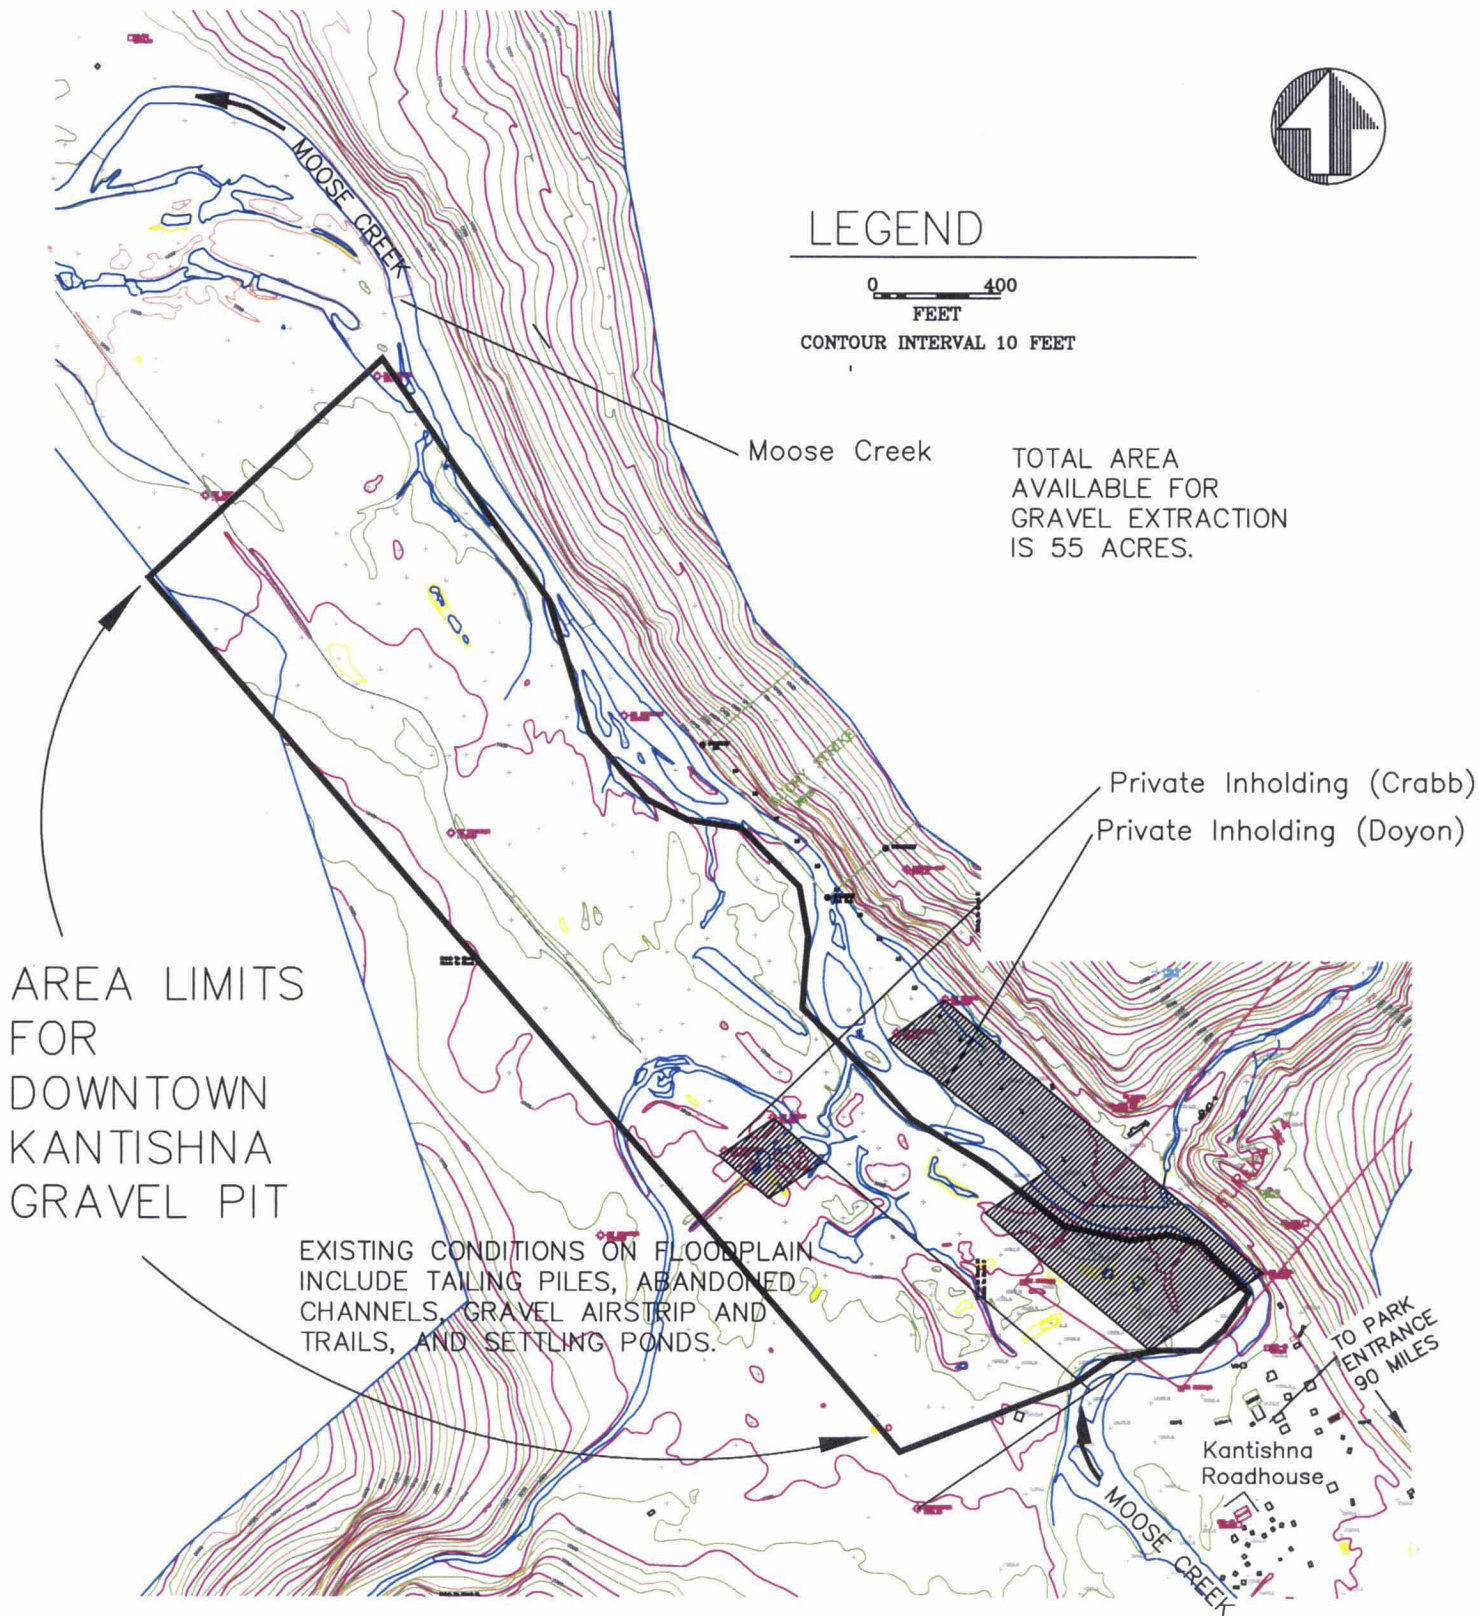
DOWNTOWN KANTISHNA RESTORATION PLAN
